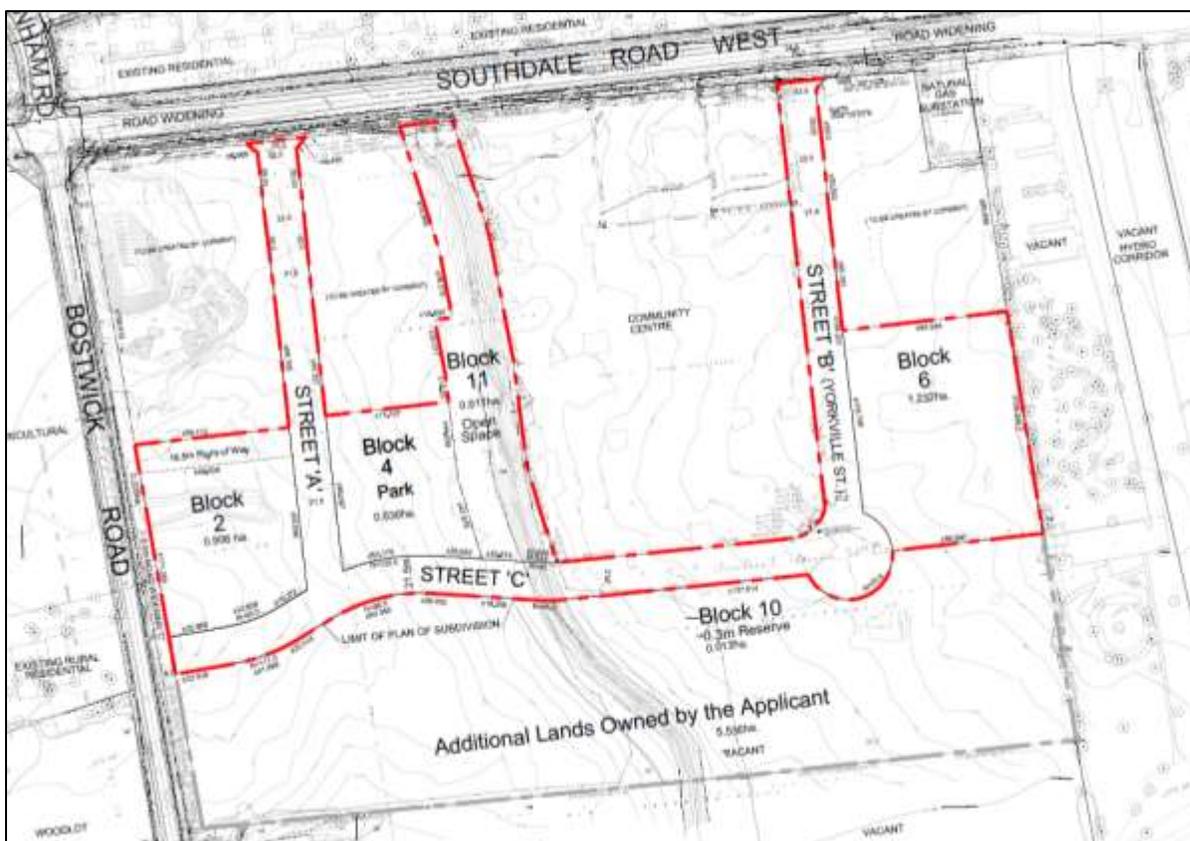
Proposed Draft Plan of Subdivision 39T-18502
